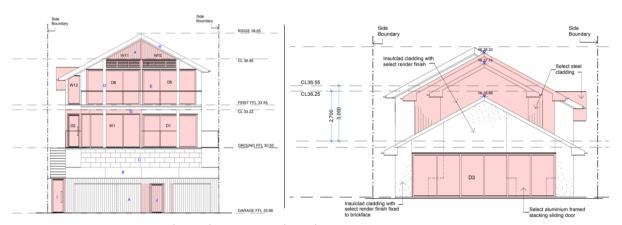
North (Front) and South (Rear) Elevation, Sheet No. 6 Dated 19.01.2022
